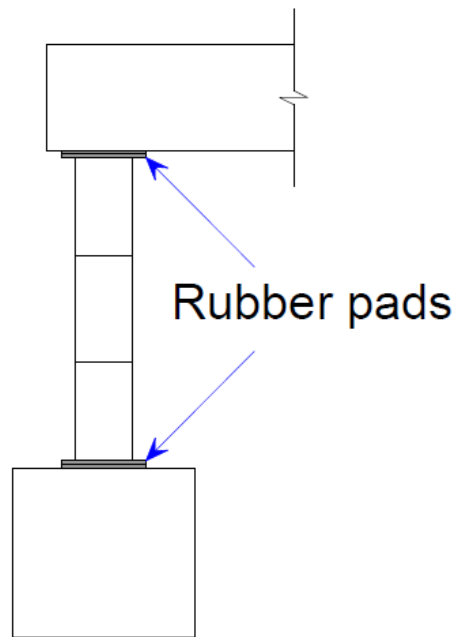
Rubber layers in specimen F-FRP3-R
